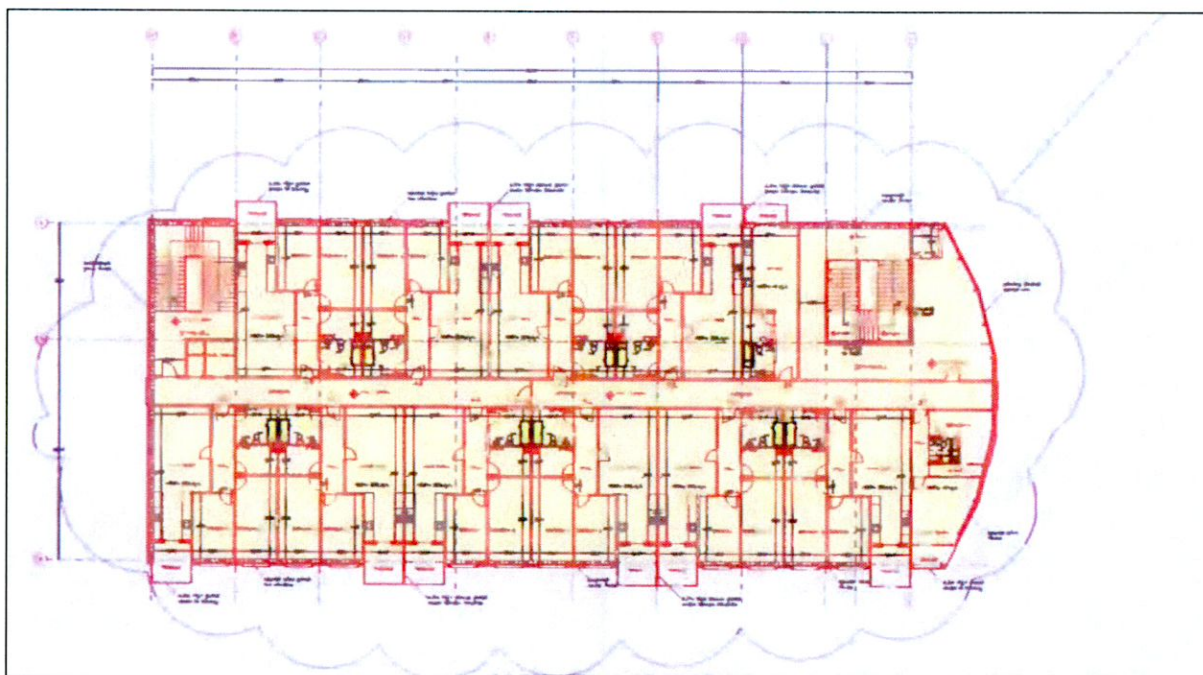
Third floor plan proposed under Reg. Ref. SD16A/0249 to amend floor layout incorporating an additional 3 no. apartment units.
